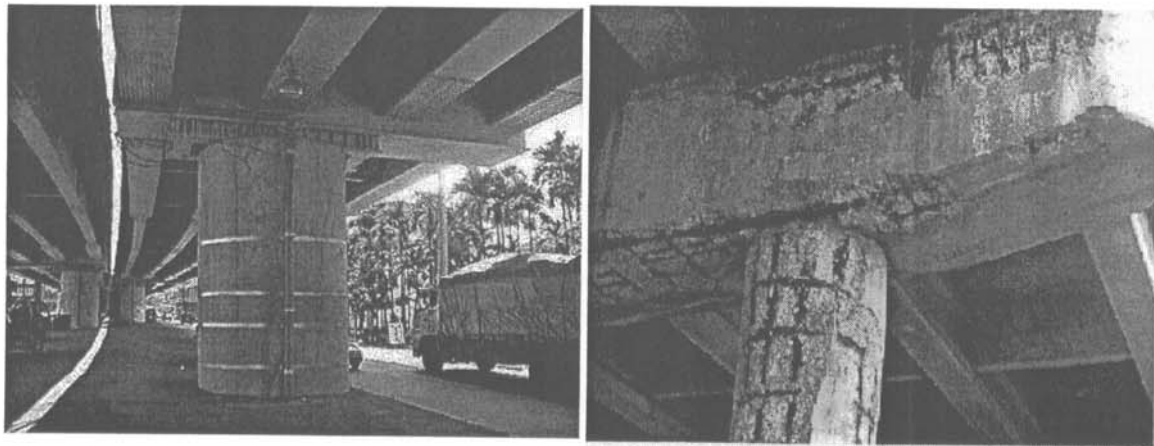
Severe cracks appeared at the tops of the concrete column after earthquake in the city of Nantao in 1999 (left). The concrete spalling happened due to the volumetric expansion of corroded steel reinforcement (right).
